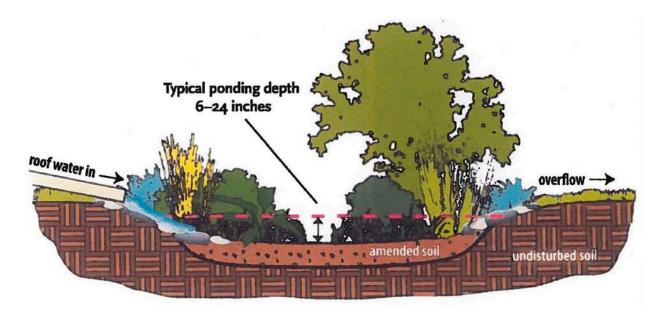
Typical Rain Garden Cross Section (Graphic: EMSWCD)
